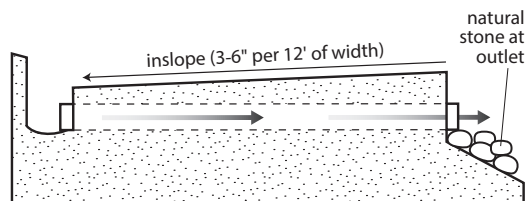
Rock used to reduce gully erosion from forming directly below a culvert outlet.
